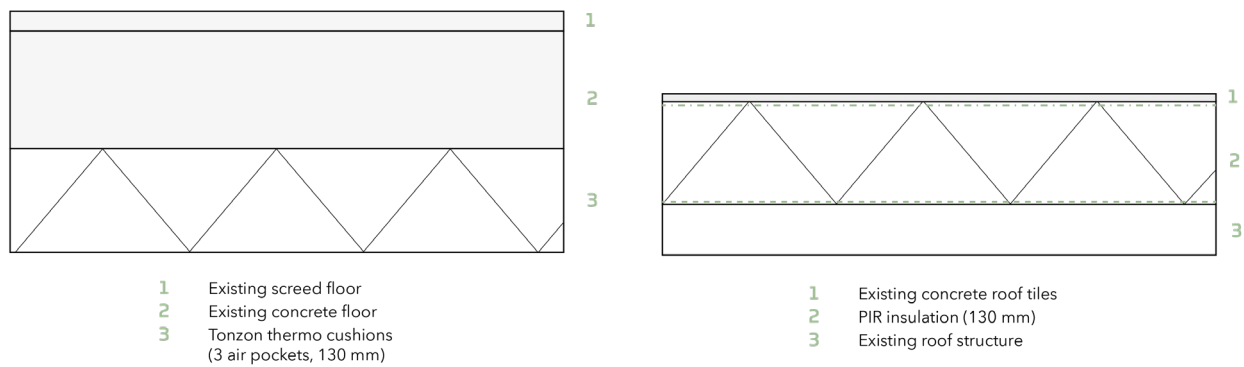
Renovation design of ground floor & flat roofs. Own work.
